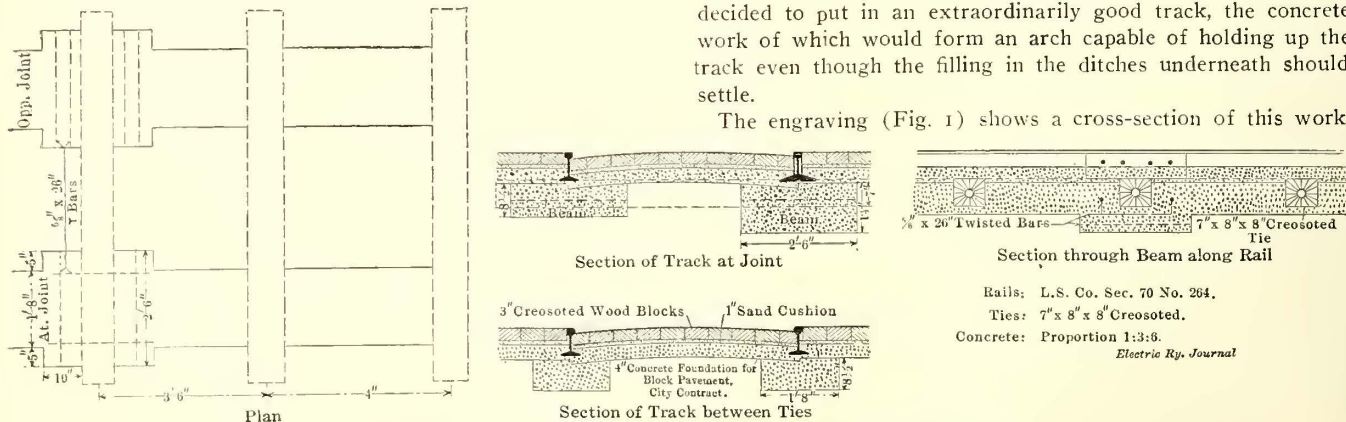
Standard Concrete Beam Construction in Mobile, Ala.
